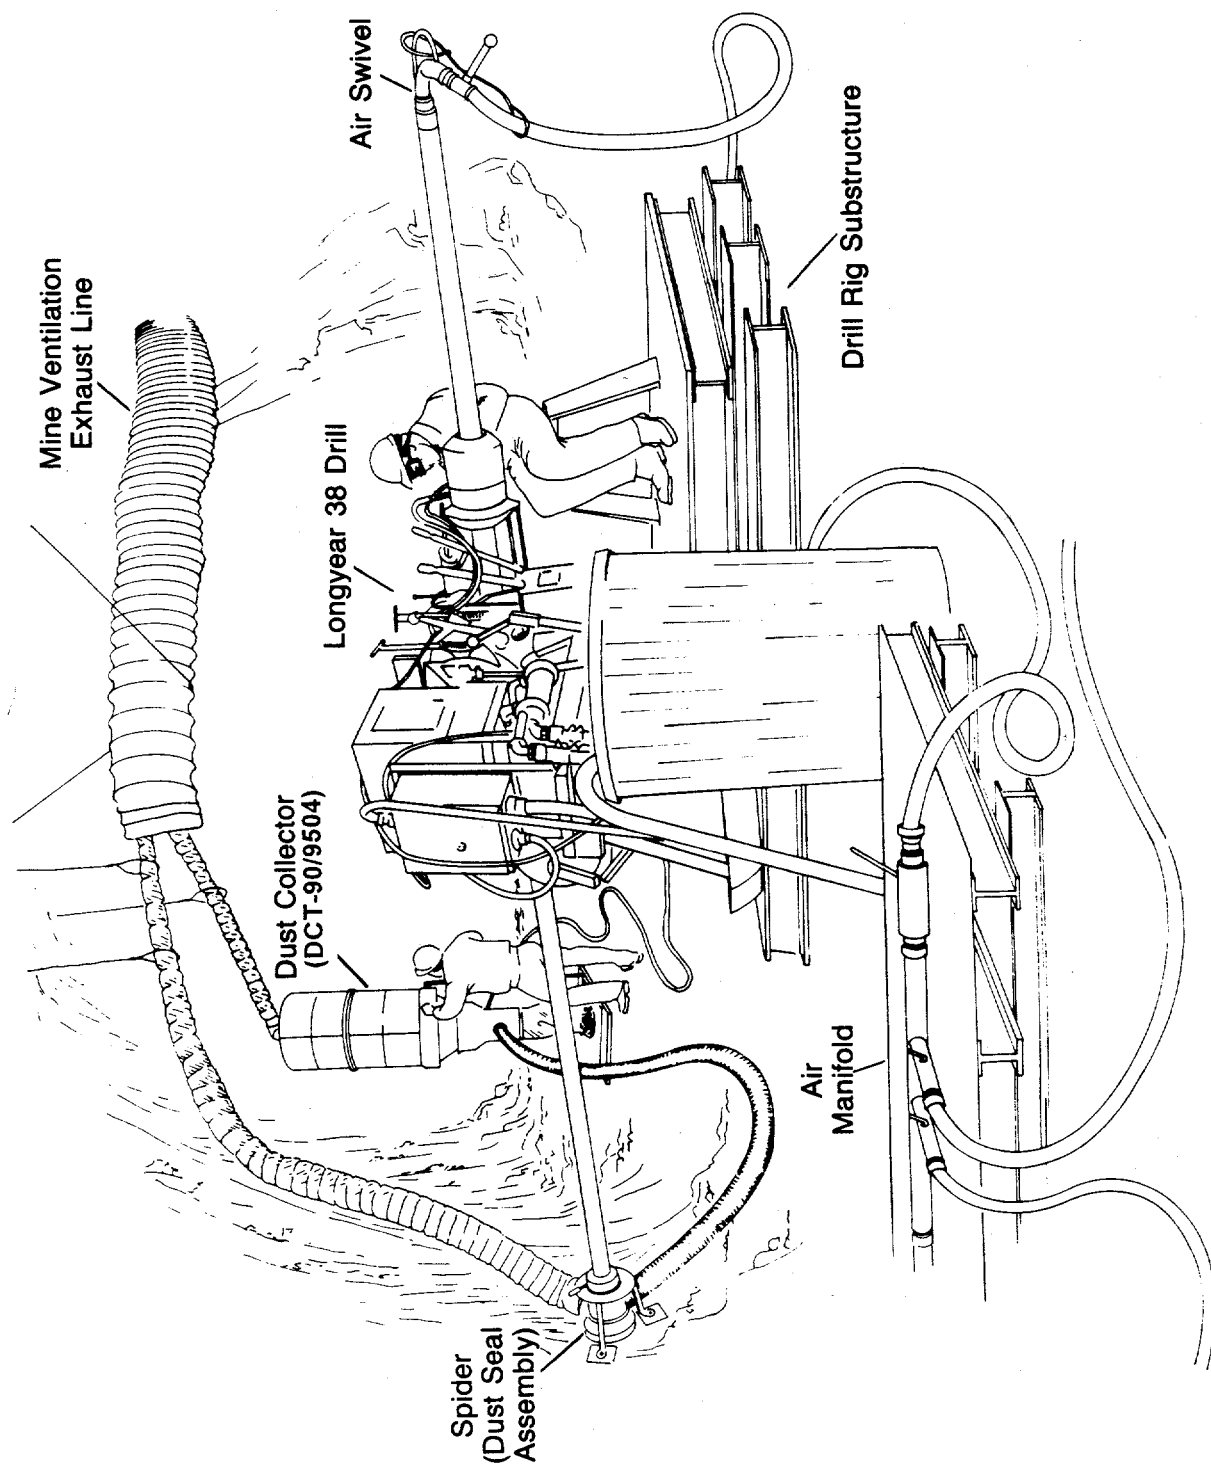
Sketch illustrating the configuration of equipment as used on Prototype Air-Coring Test hole AC-2.
